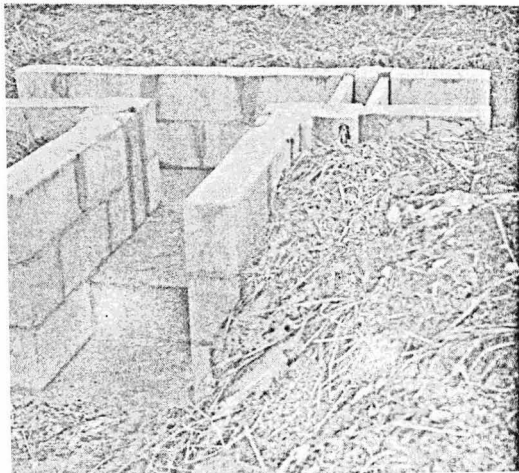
A turnout containing short drop constructed of six-inch concrete wall blocks.
